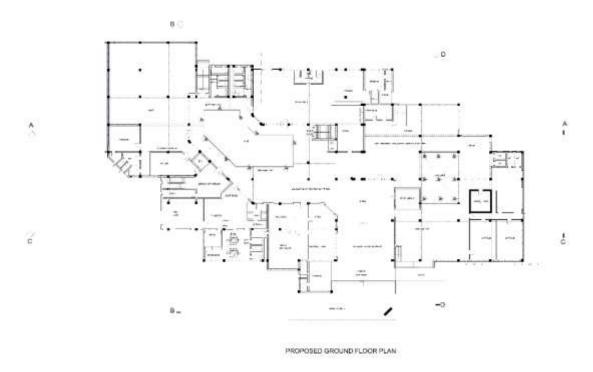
Proposed ground plan for office complex Source: Authors' design (2020)
